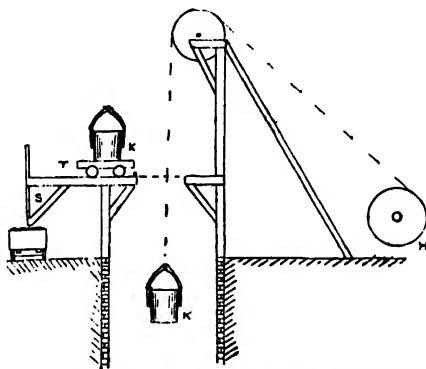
Surface arrangements at a Sinking Pit, showing how the material is raised and tipped
